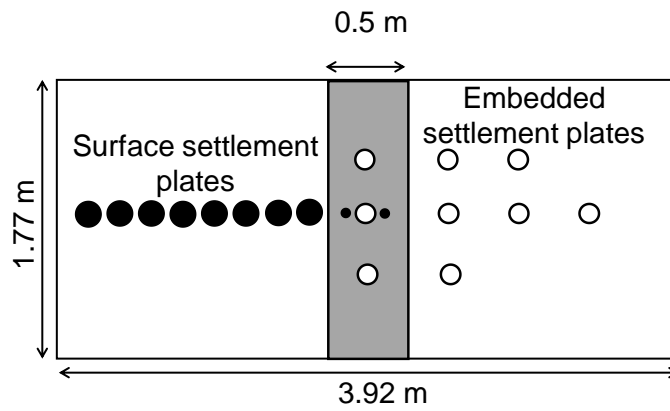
Example of instrumentation layout for vertical loading of footings: Plan
